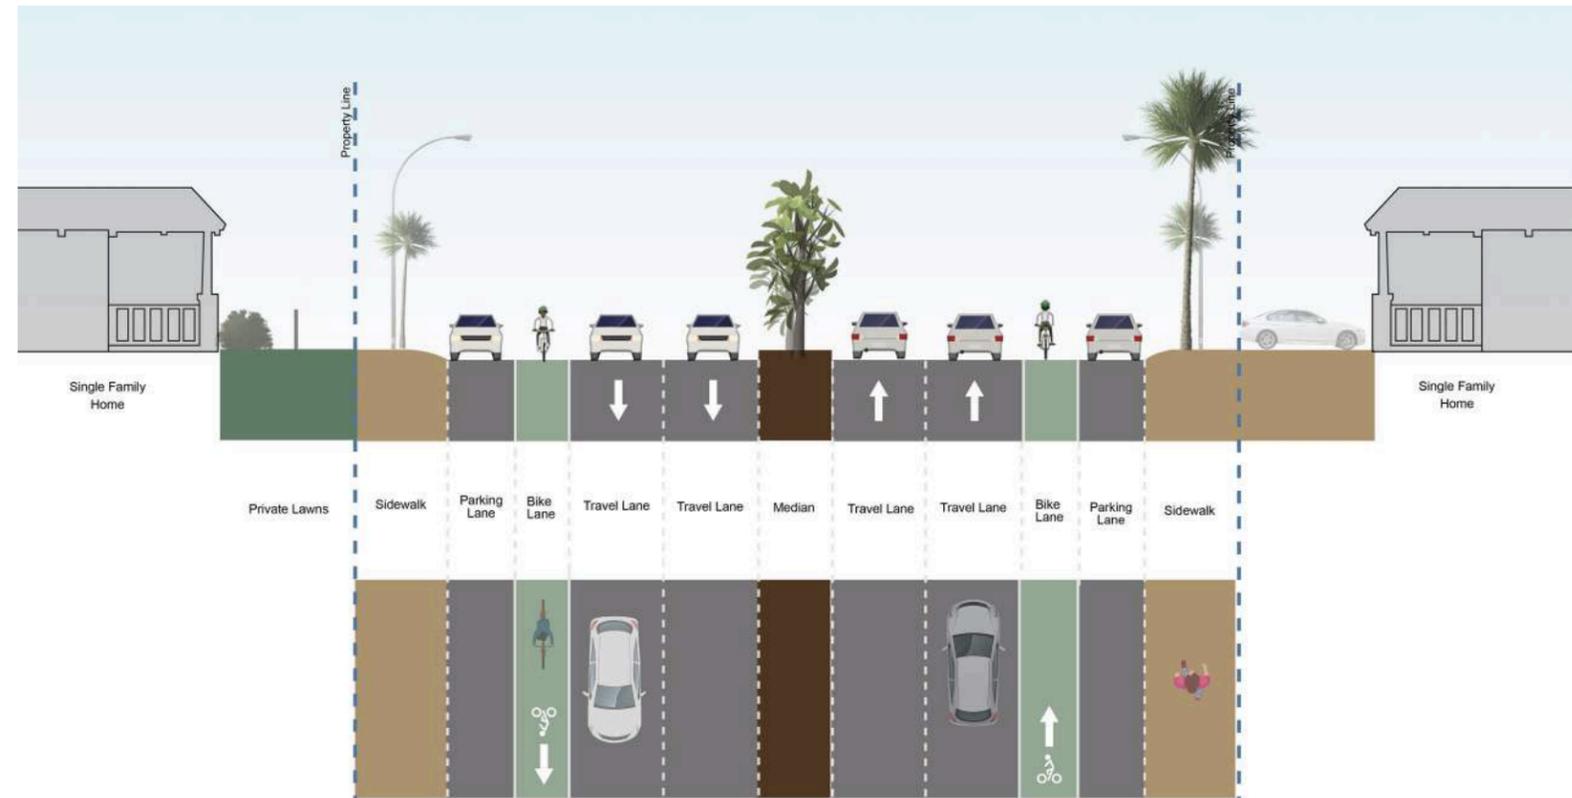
Existing Street Section - E. Ventura Ave. @ 1st St.
